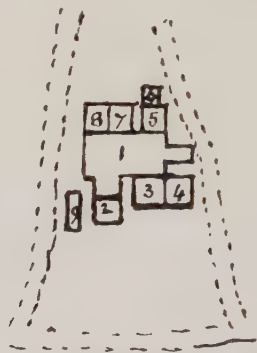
Ground-plan of Haslemere Town Hall and Market-house, with surrounding shops, &c.
